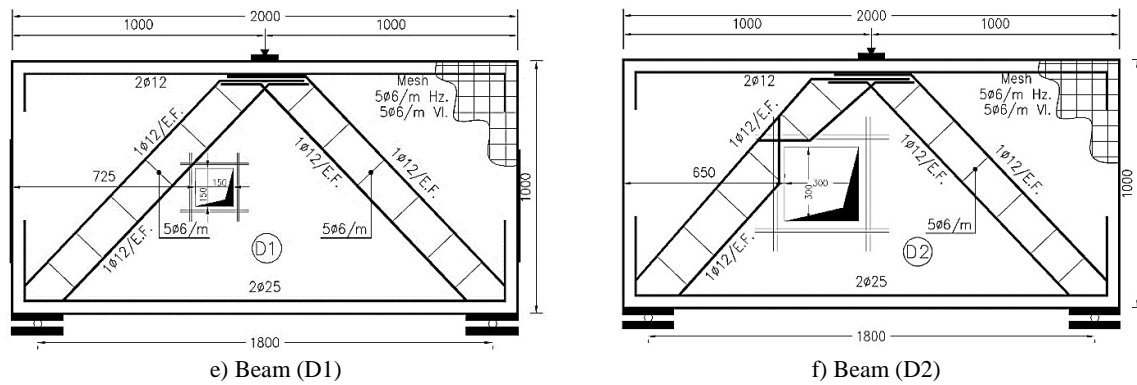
Details of beam specimens with openings (Type I). (Dimensions are in mm)
